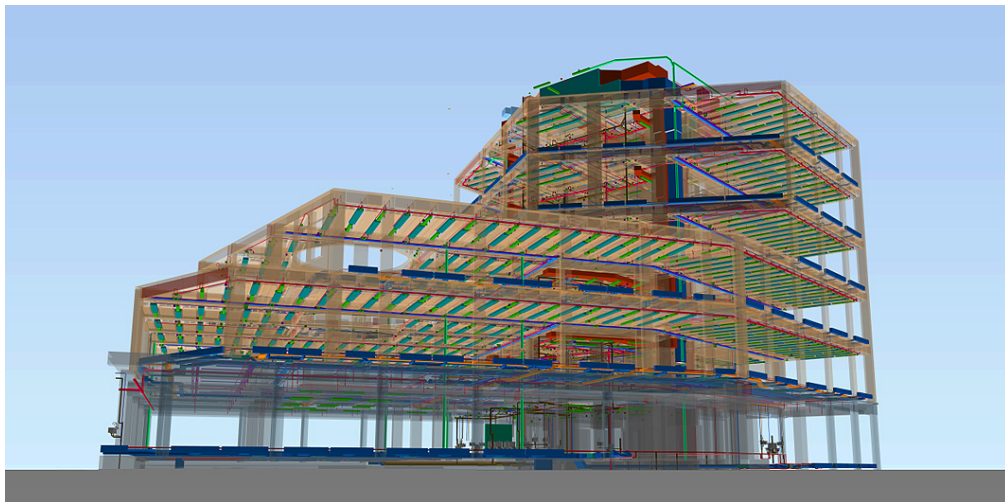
Building Information Model (BIM) – showing structure (timber + concrete) and services. SITRA Office: Helsinki, Finland; Sauerbruch Hutton Architects. (Model: Arup)
